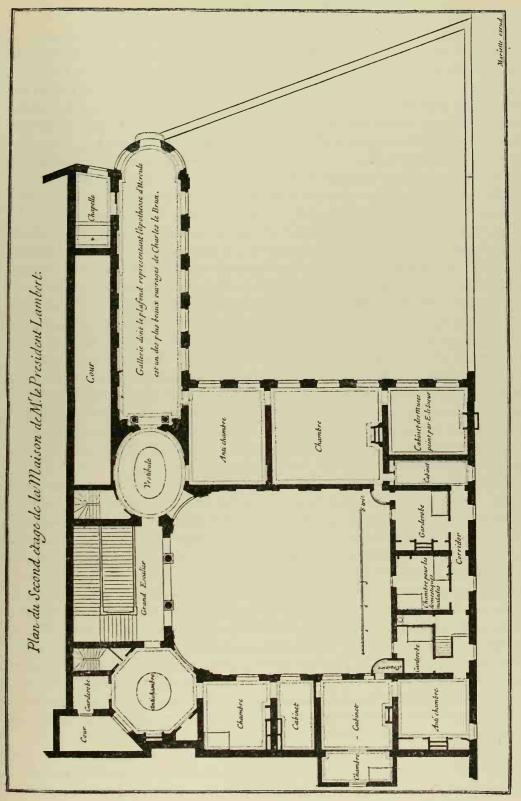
Le Vau: Hôtel Lambert: Plan of second floor
